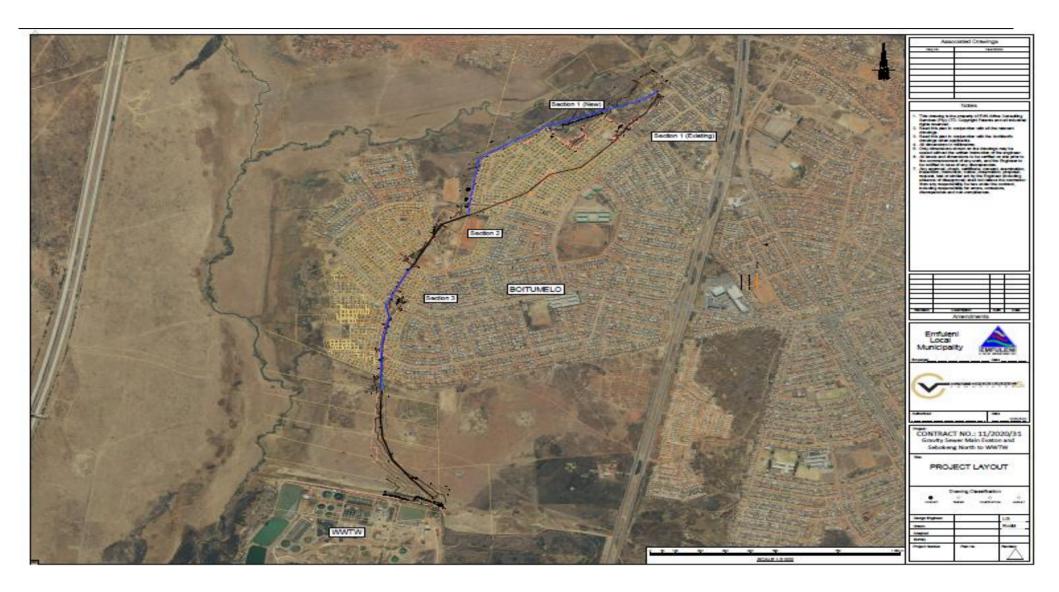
Proposed sewer upgrade of gravity sewer main Evaton and Sebokeng north (CV Chavane Engineering 2020)
